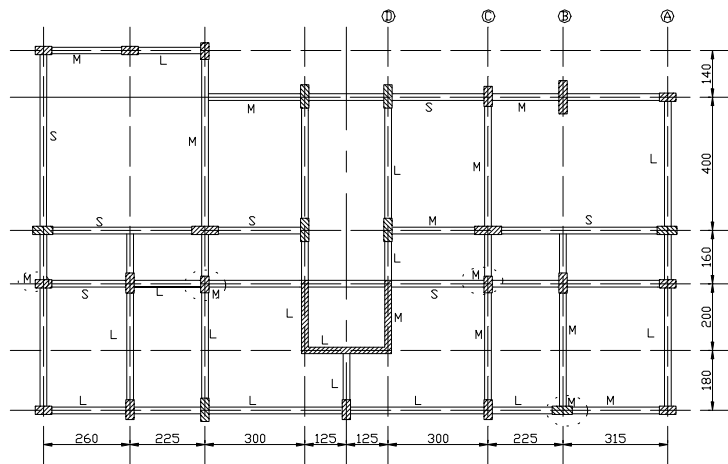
Simplified plan of a typical story of the building showing the damage observed on the structural elements (L: Light damage, M: Medium damage, S: Severe damage)
